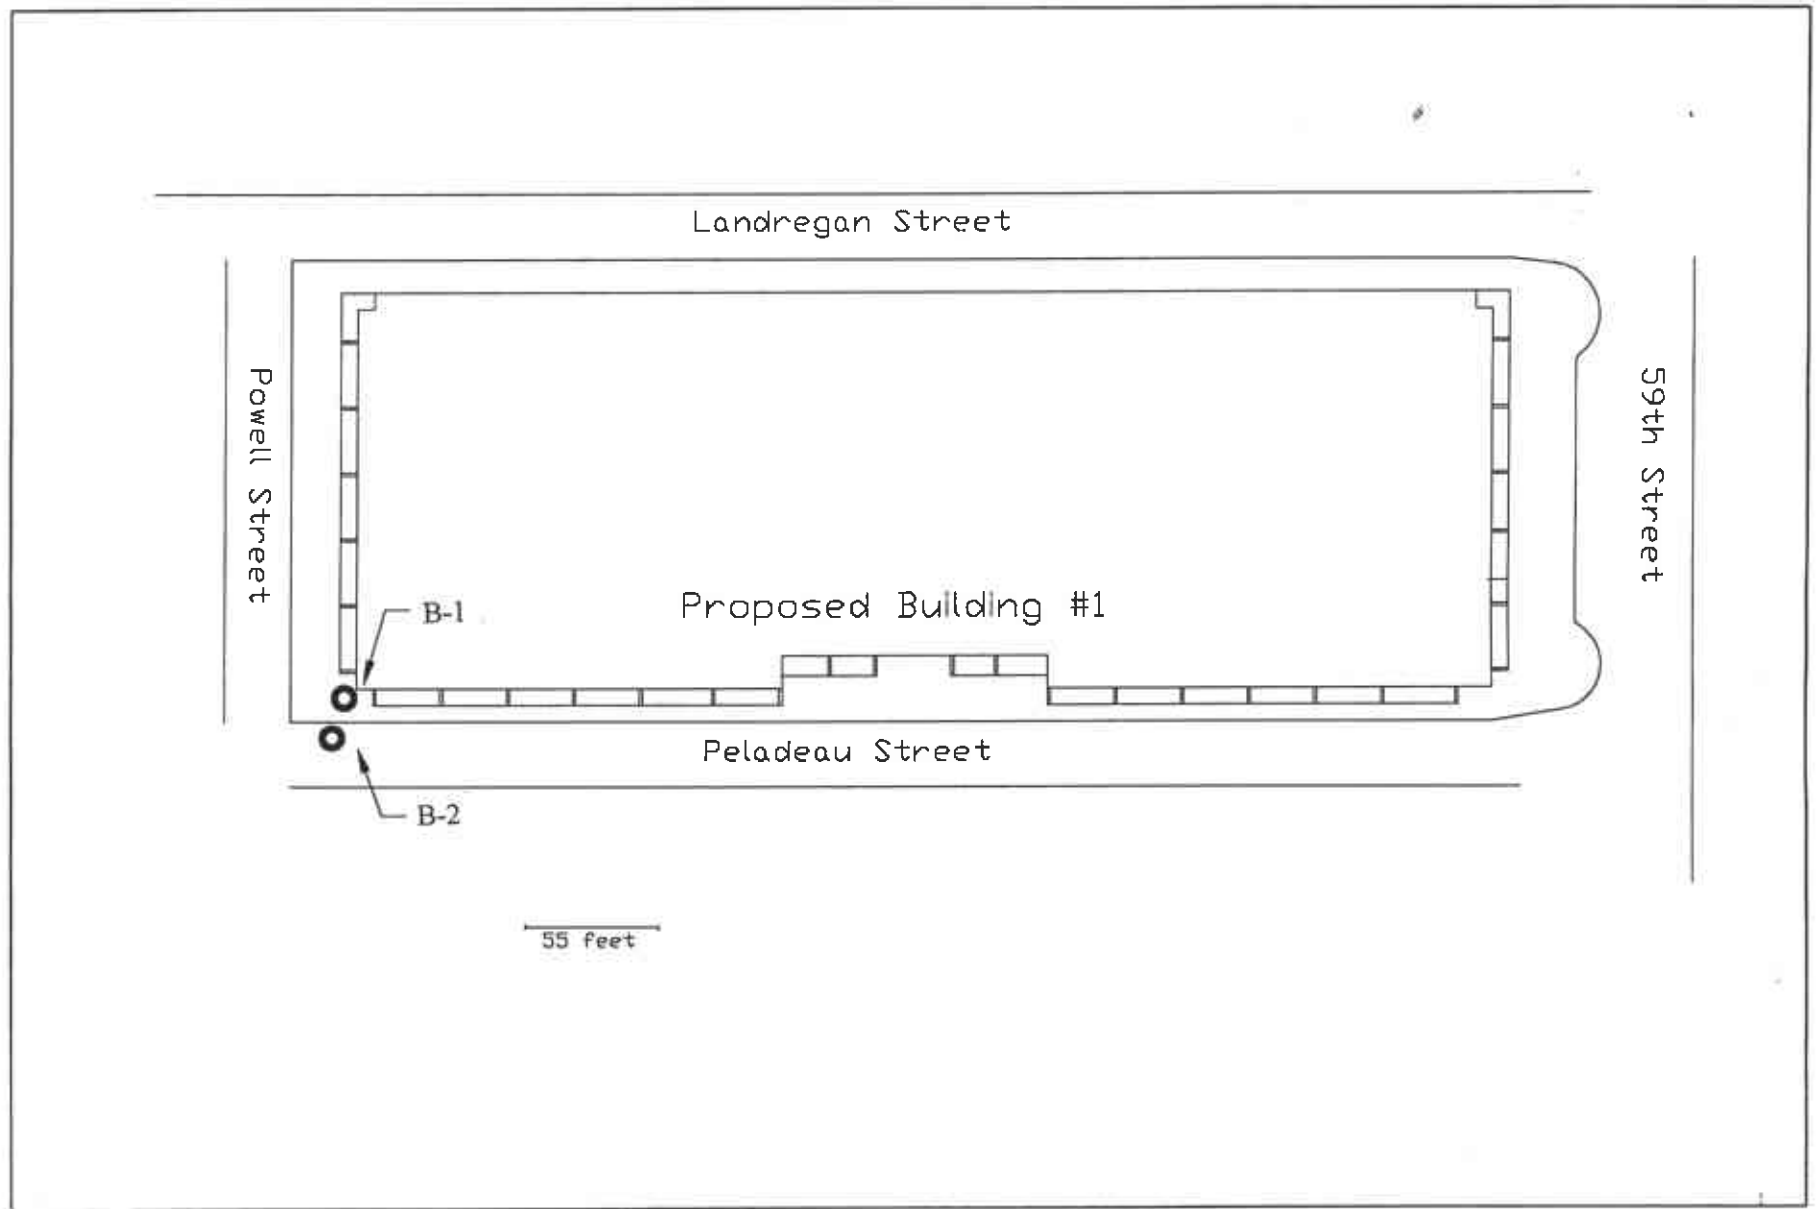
Location of Off-Site Borings at Intersection of Peladeau and Powell Streets
